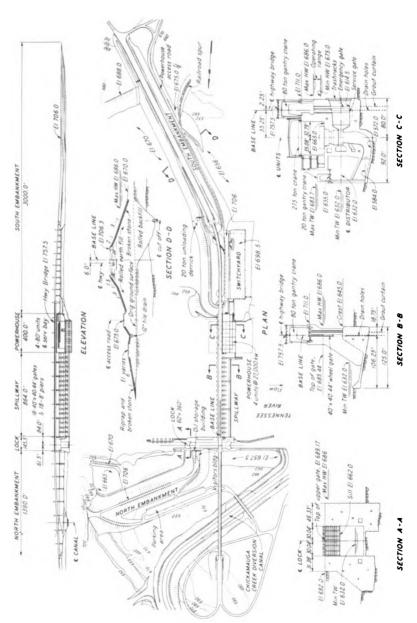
Chickamauga—plan, elevation, and sections.
